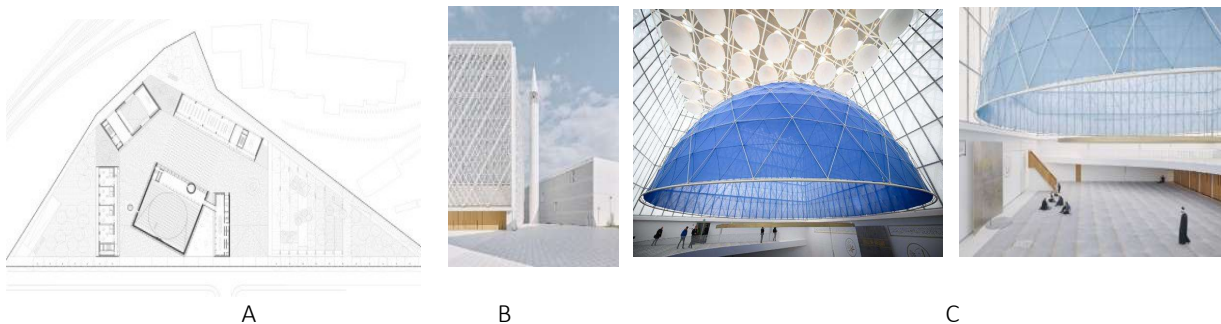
(a) floor plan of the Islamic Cultural Center in Ljubljana 2015 [45] (b)outside shot (c) prayer hall [46].
